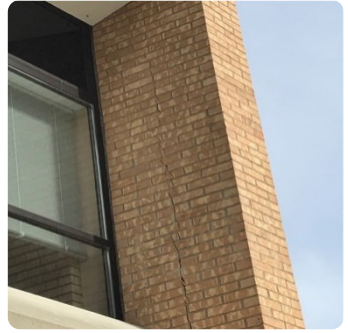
Cracks in the mortar of the exterior brick walls had formed and would have grown worse with additional freeze-thaw cycles.
